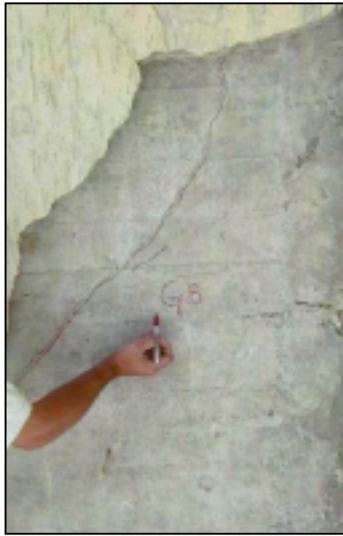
Diagonal crack in column G8 at the ground story
